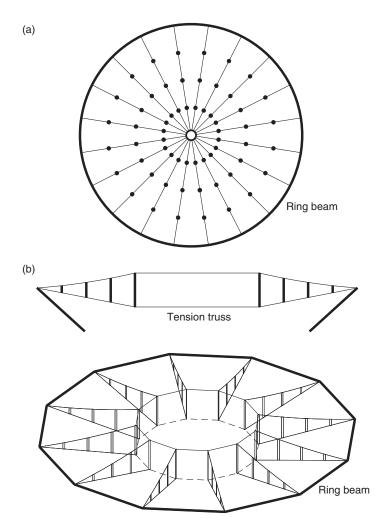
Cable girder domes: (a) full-plan form; (b) form with opening.
